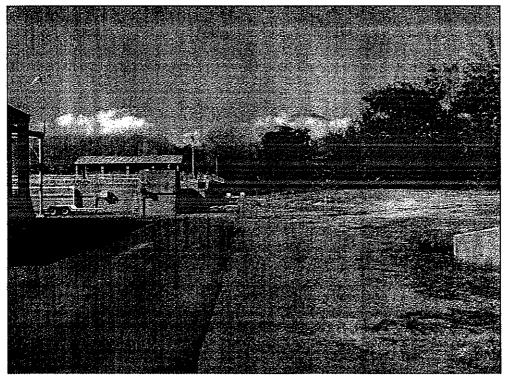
View to the west of sludge holding tanks (1) and treatment facility.
